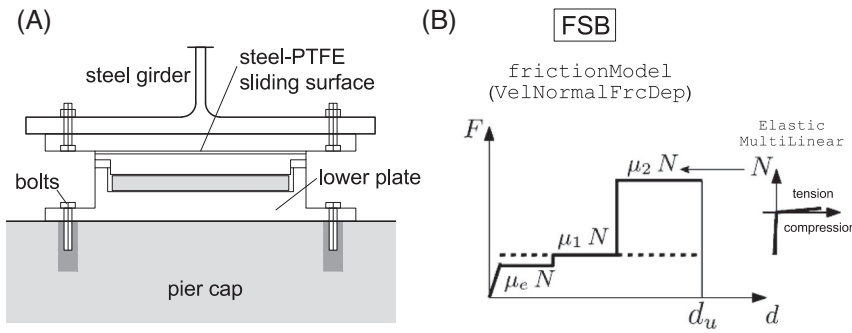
Mobile bearings: (A) bearing section, (B) mechanical model.
